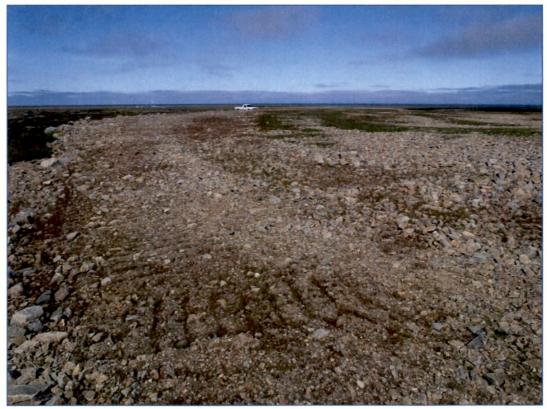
Site 9 Landfill – Southeast side of landfill, facing northwest.
